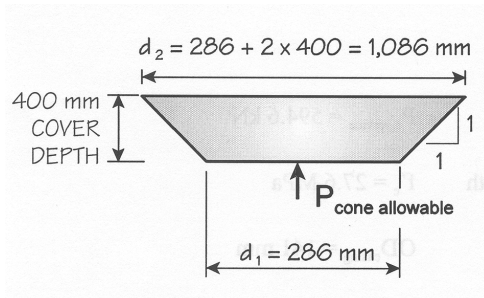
Pile Top to Abutment Footing Connection Detail
